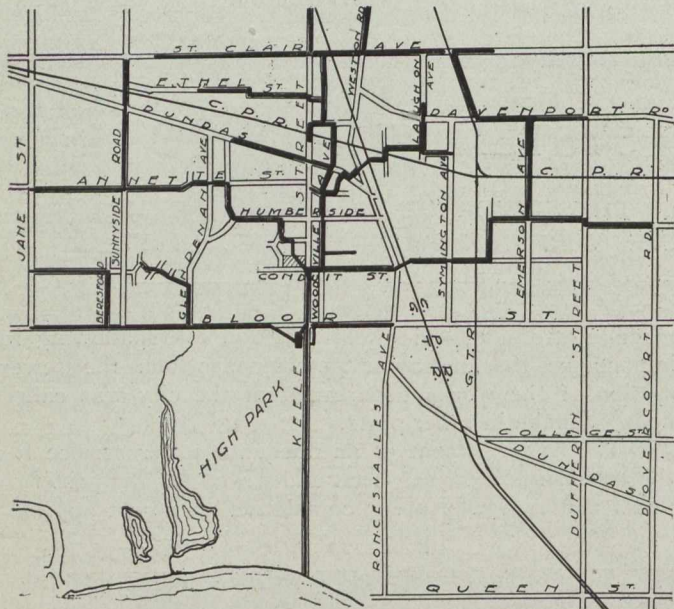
Sketch Plan of the Keele Street Storm Overflow Sewer Area, Toronto.
